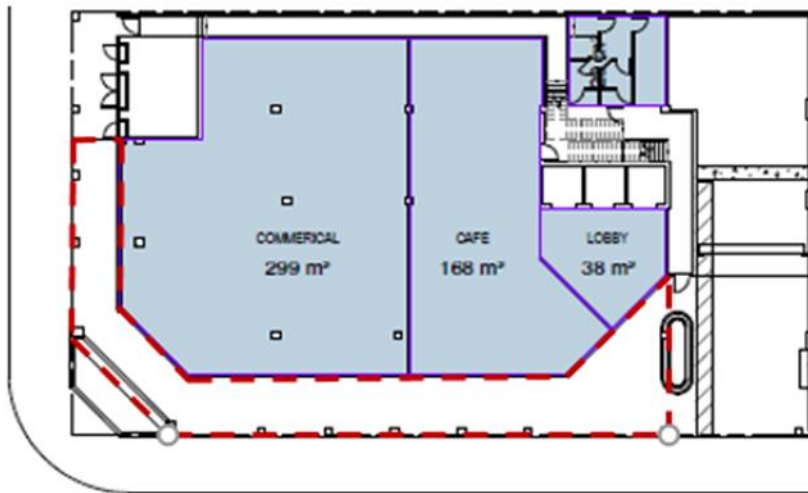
Location of the colonnade proposed to be filled-in outlined in red
